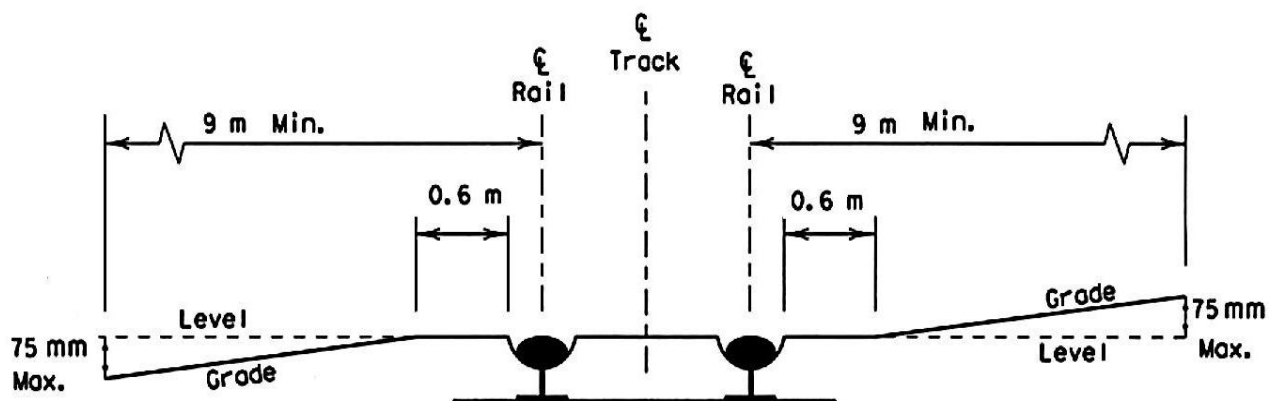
/1: Railroad-Highway Grade Crossing [4, p. 736]
